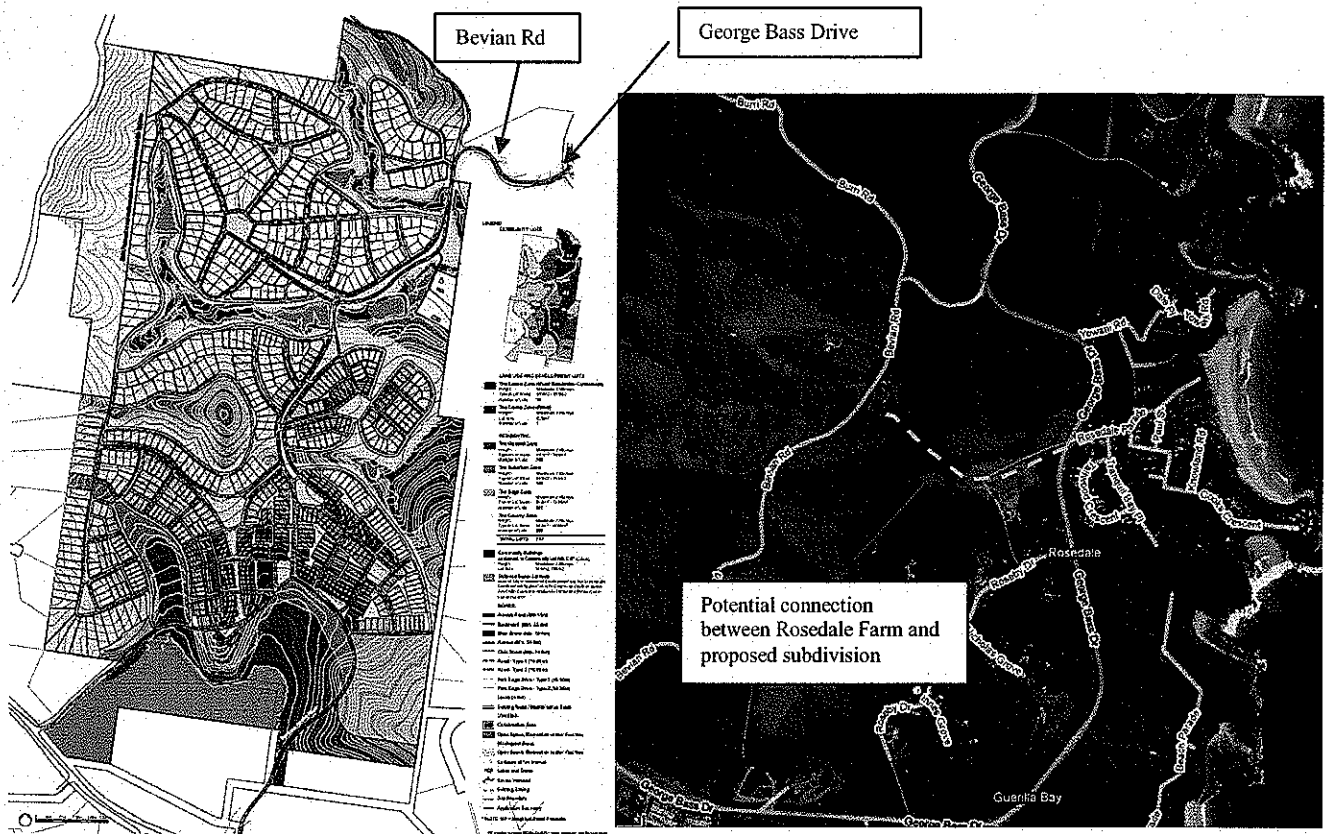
Plan depicting location of northern road access to George Bass Drive and potential connection between Rosedale Farm and proposed subdivision
